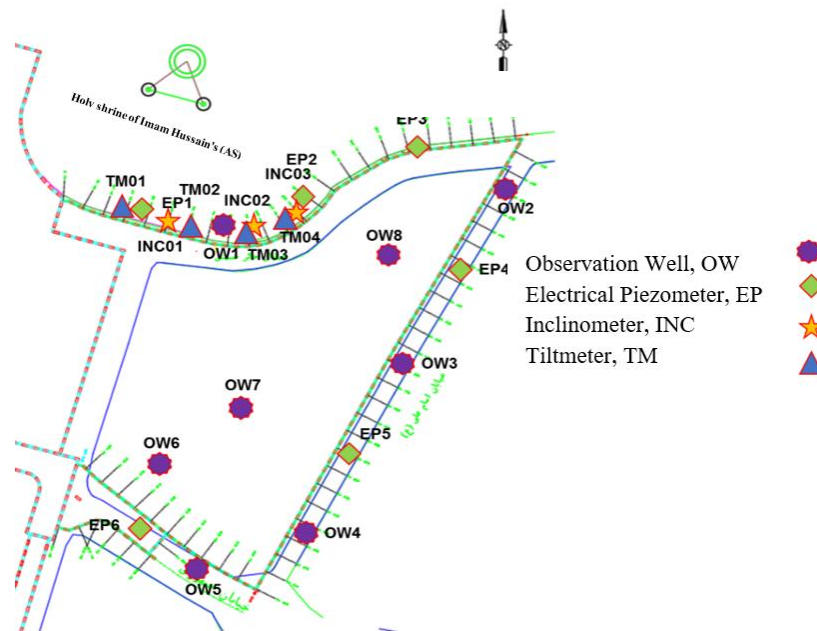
Placement of the proposed precision instruments for Imam Hassan's (AS) courtyard
